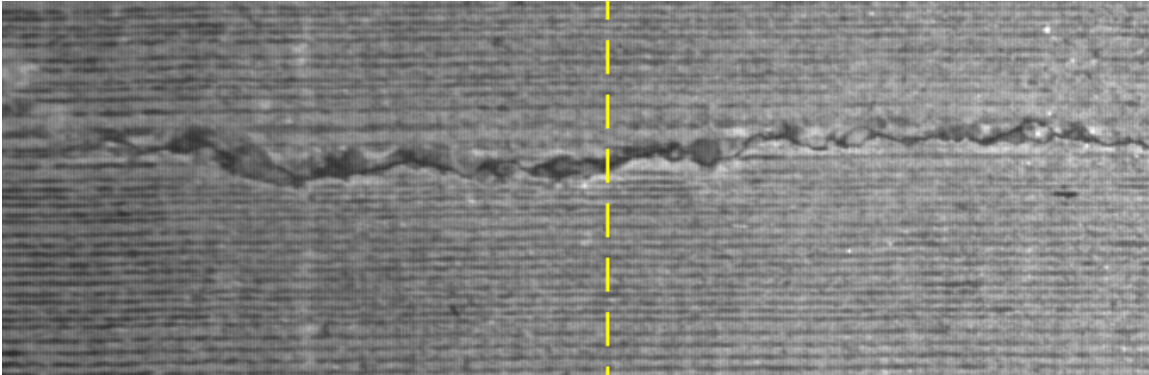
Original image of a typical spalled crack in tinning concrete pavement
